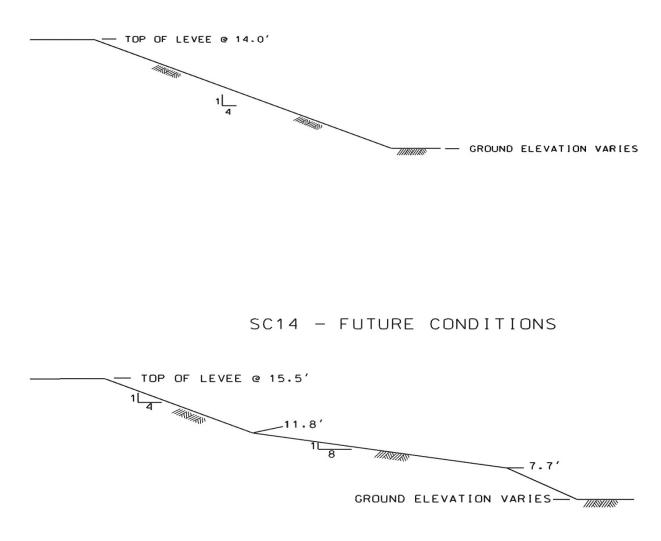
Typical Levee Design Cross-sections Airport Runway Levee (SC14)
